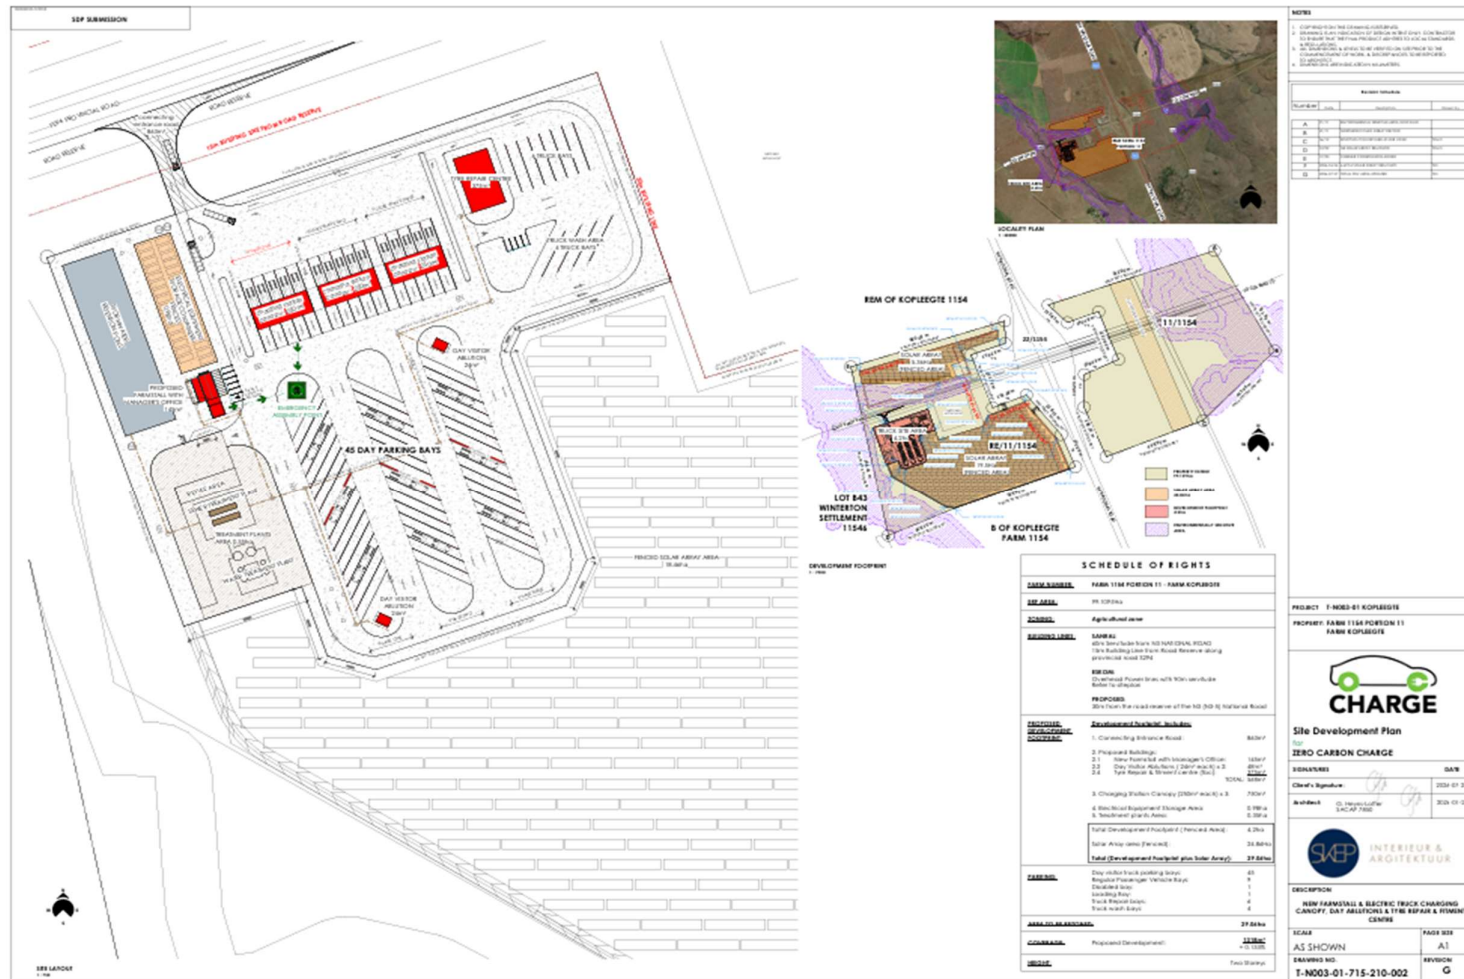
Detailed layout (SDP – Spatial Development Plan)
